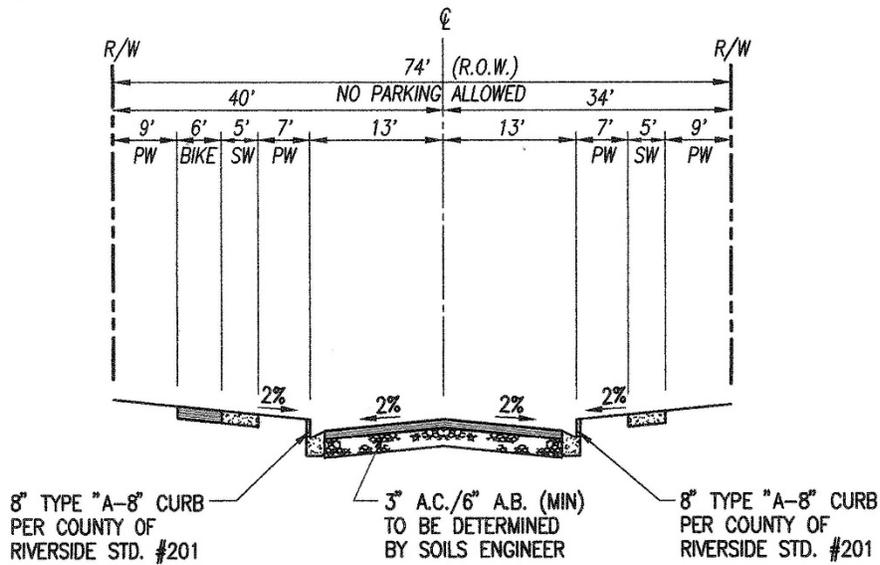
VTTM 34017 (Waterbury) Overlay Local Street "A" Cross-Section
